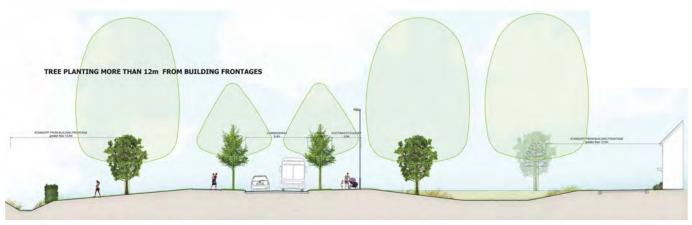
Tree Planting Section showing tree planting more than 12m from building frontages
